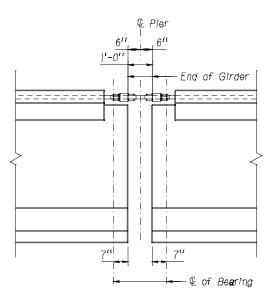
Elevation View of Threaded Rod Continuity Connection at the Piers
